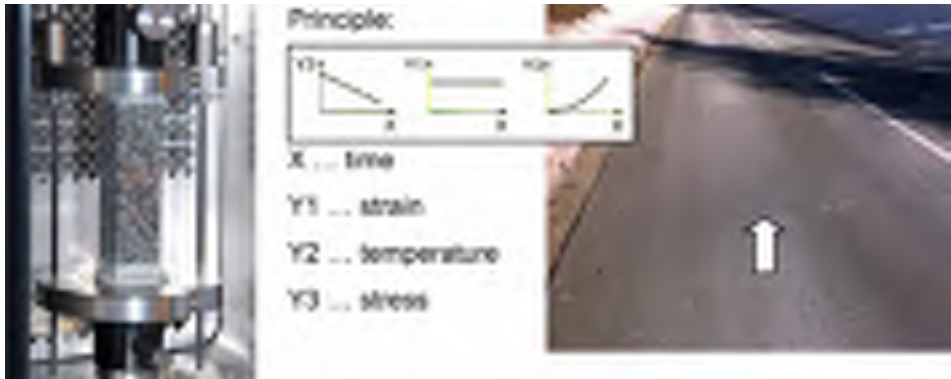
Tensile Stress Restrained specimen Test – TSRST (left) and transversal thermal crack (right) [3]
